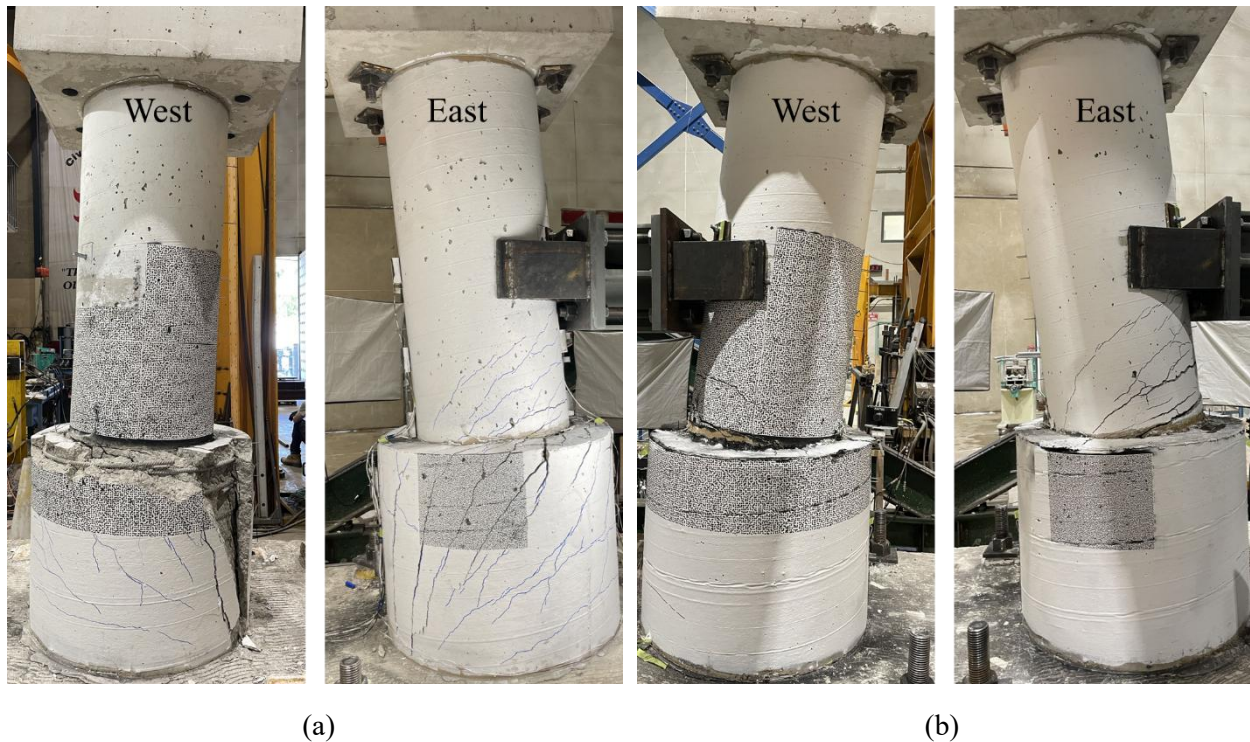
Final damage state: (a) specimen #1 and (b) specimen #2
